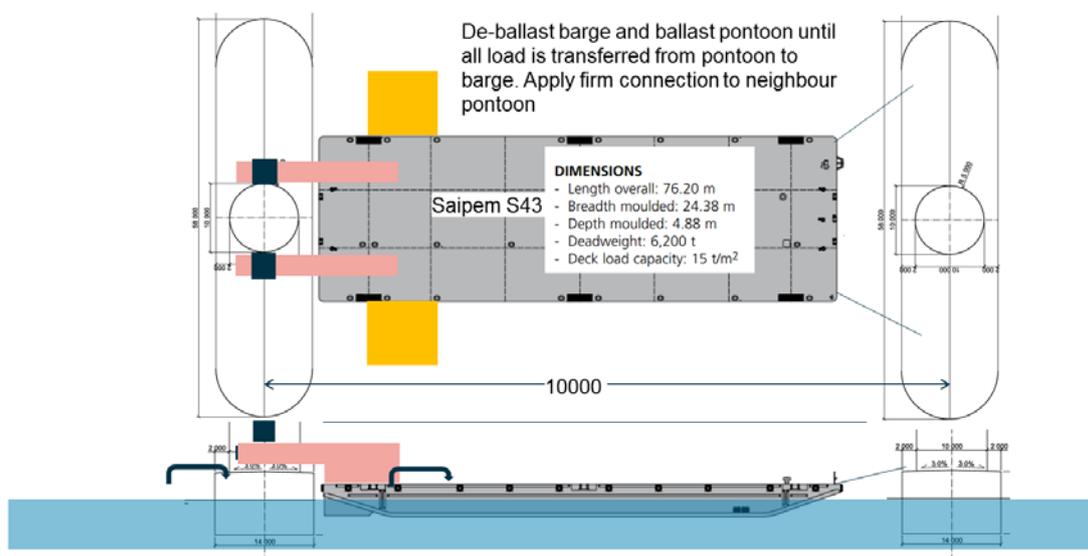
Transfer of load from bridge pontoon to barge prior to pontoon replacement
